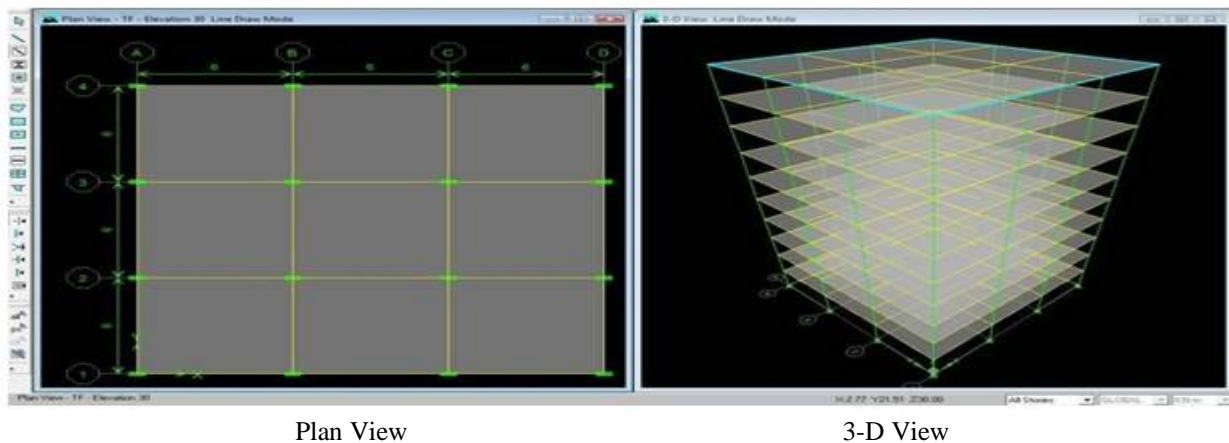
showing G + 9 Storey Building without Shear Wall
